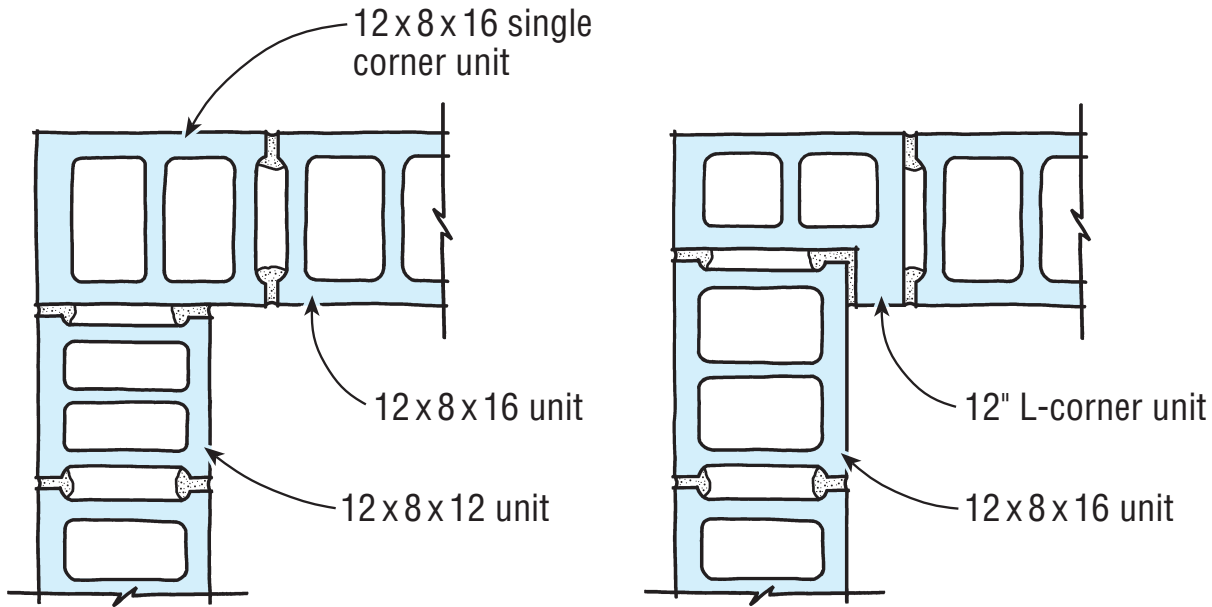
FIGURE H: CORNER LAYOUT FOR 12-IN. BLOCK
